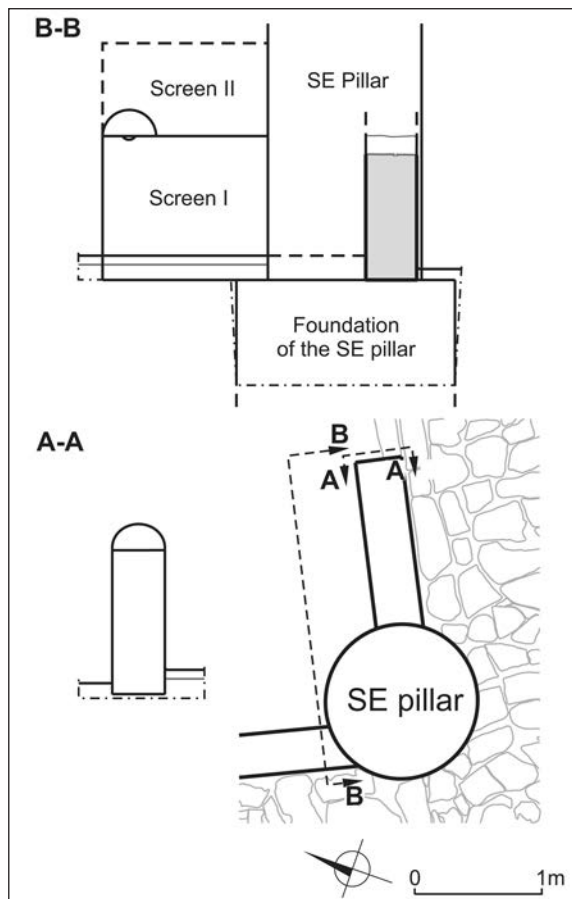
Southern altar screen wall: sections through foundations of the southeastern pillar and the late changes to the wall
